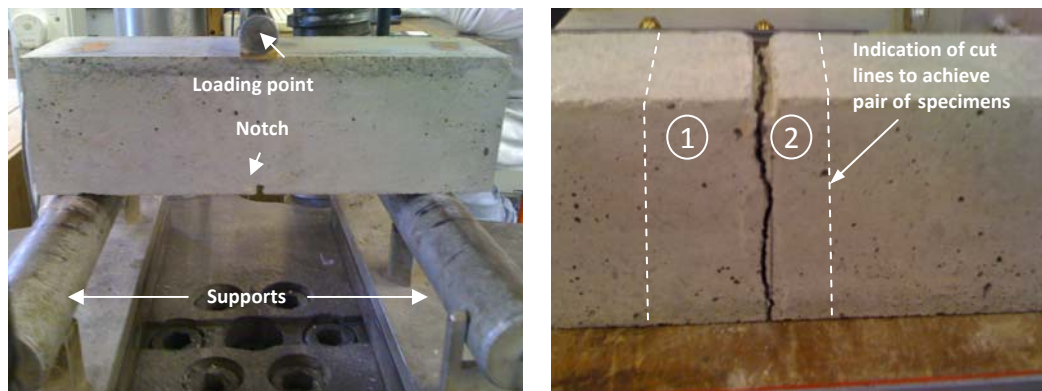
Manufacture of naturally cracked specimens a) Three point bend test arrangement b) Extraction of specimens from cracked zone of prism
